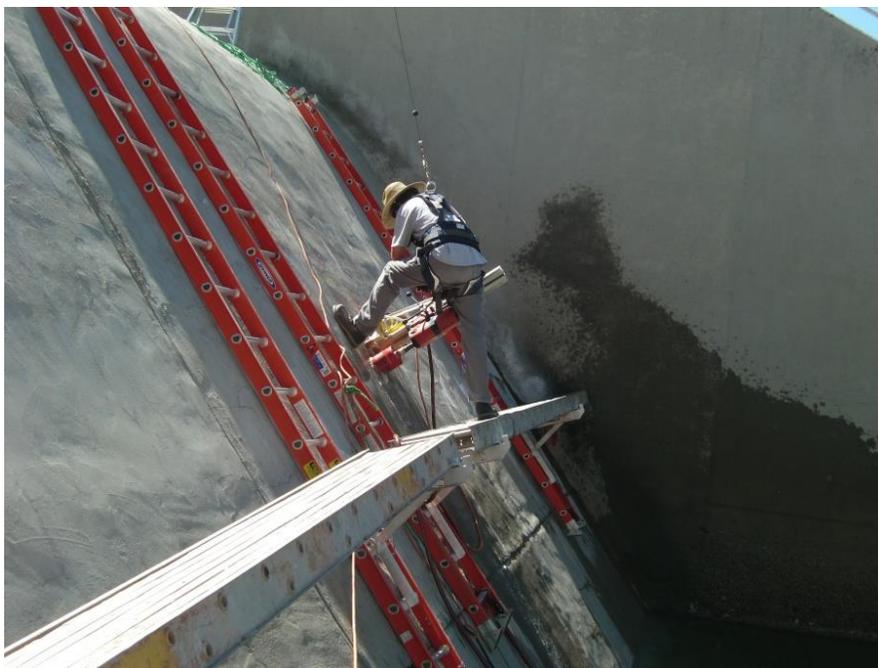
Coring through the temporary shotcrete repairs to obtain samples of concrete for testing and examination.
